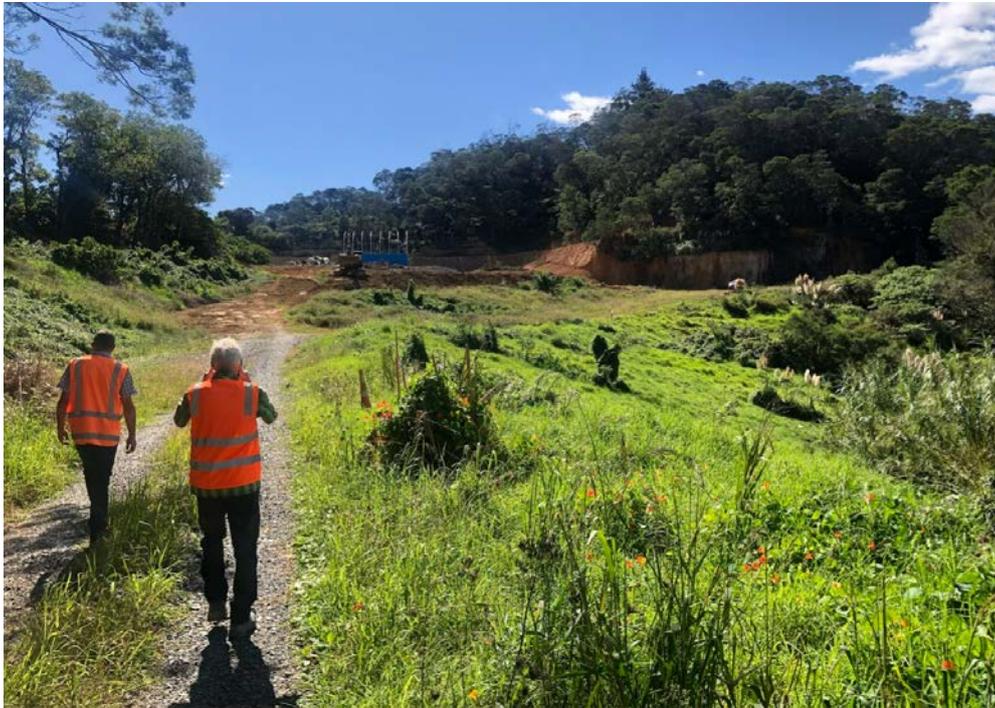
View looking north-east from central bench. Top of landfill in distance, old fill slope (right of photo).
